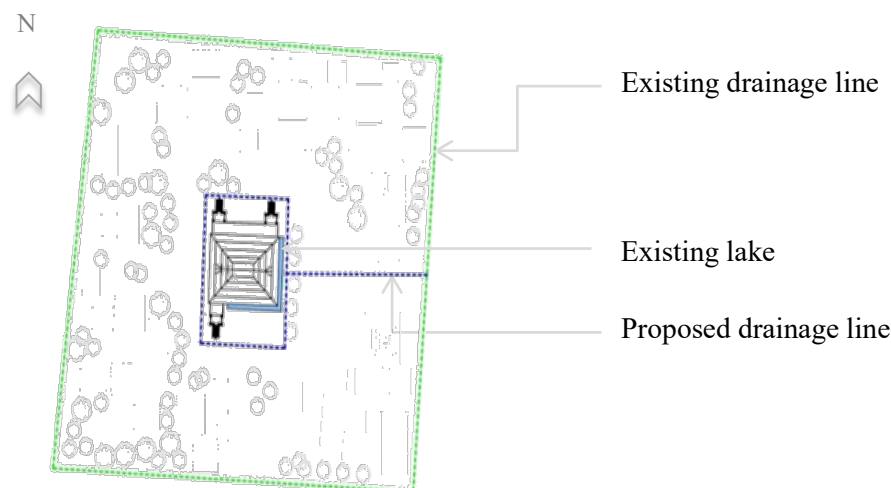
Plan of existing and proposed drainage line. Source: Drawn by author, 2022.
